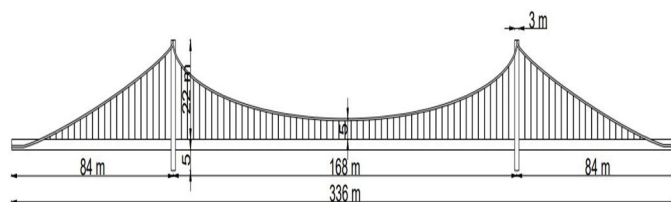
Shows the plan of the bridge on AutoCAD showing the total length to be 336 m, tower height 22 m above the deck and 5 metres below the deck, centre span on the bridge to be 168 m, and side spans are 84 m each.
